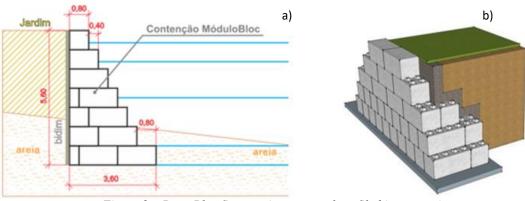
BetonBloc System a) transversal profile b) perspective. Source: Authors (2023).
